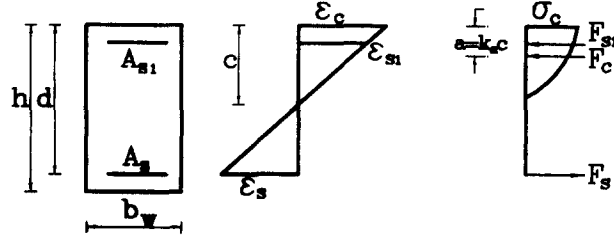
Reinforced concrete cross section, dimensions, stress and strain distribution and the acting internal forces.
